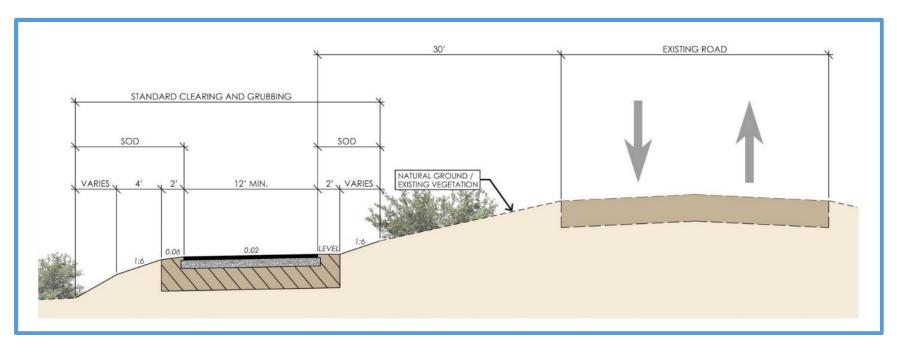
Typical Section, E-W MINWR Alternative 1 (along North Side of Beach Road)
